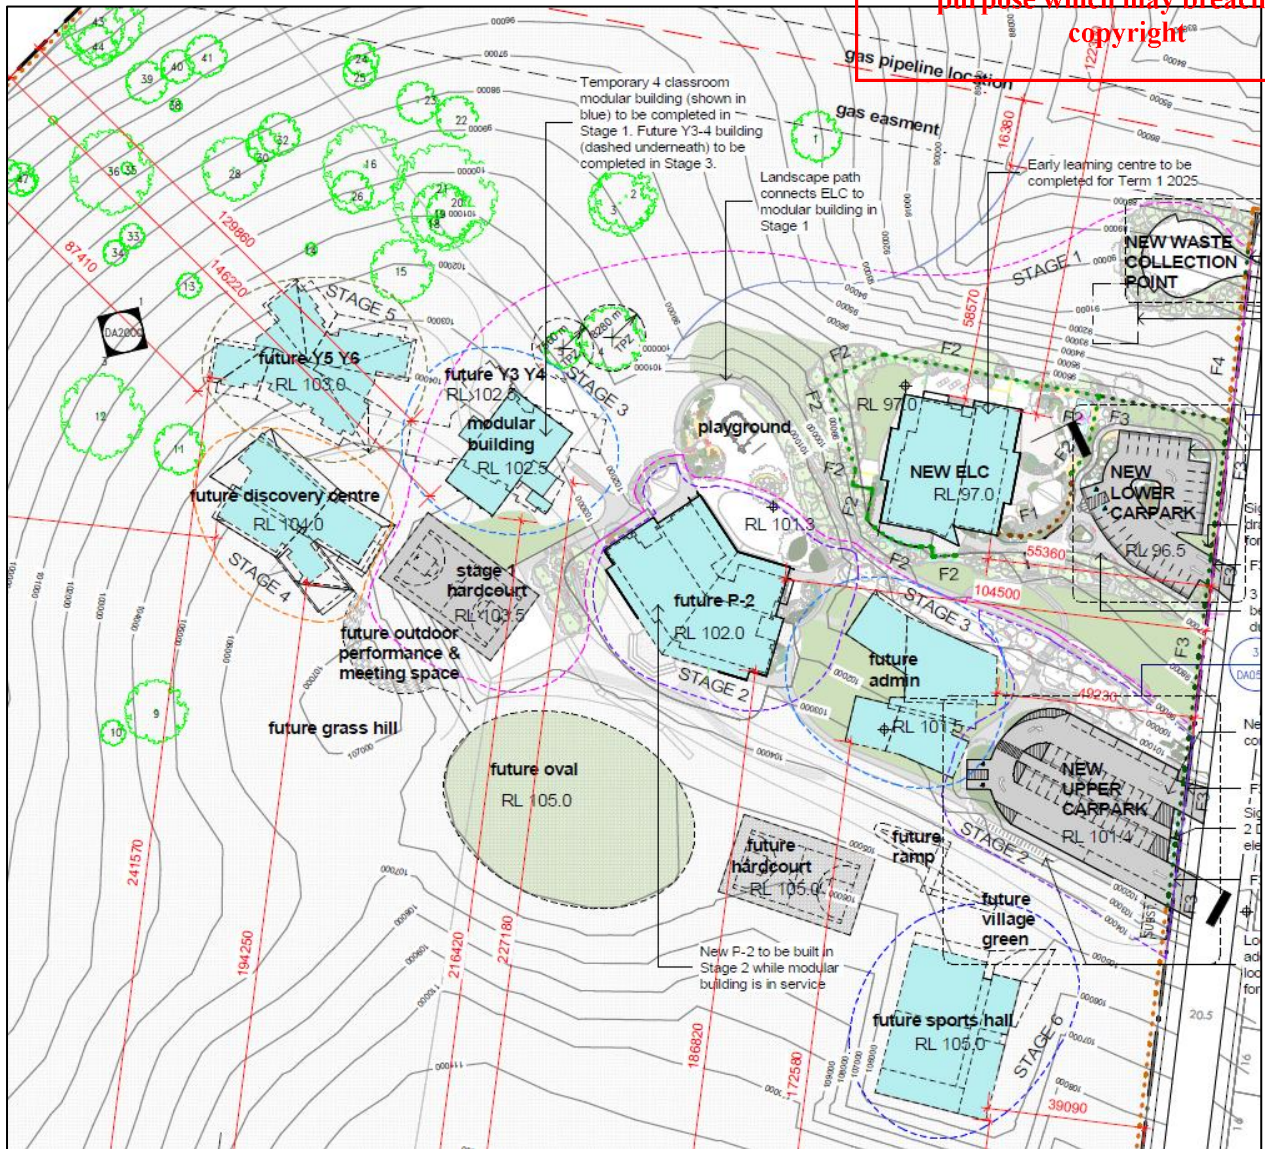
Proposed Site Plan – Smith+Tracey Architects – November 2023
